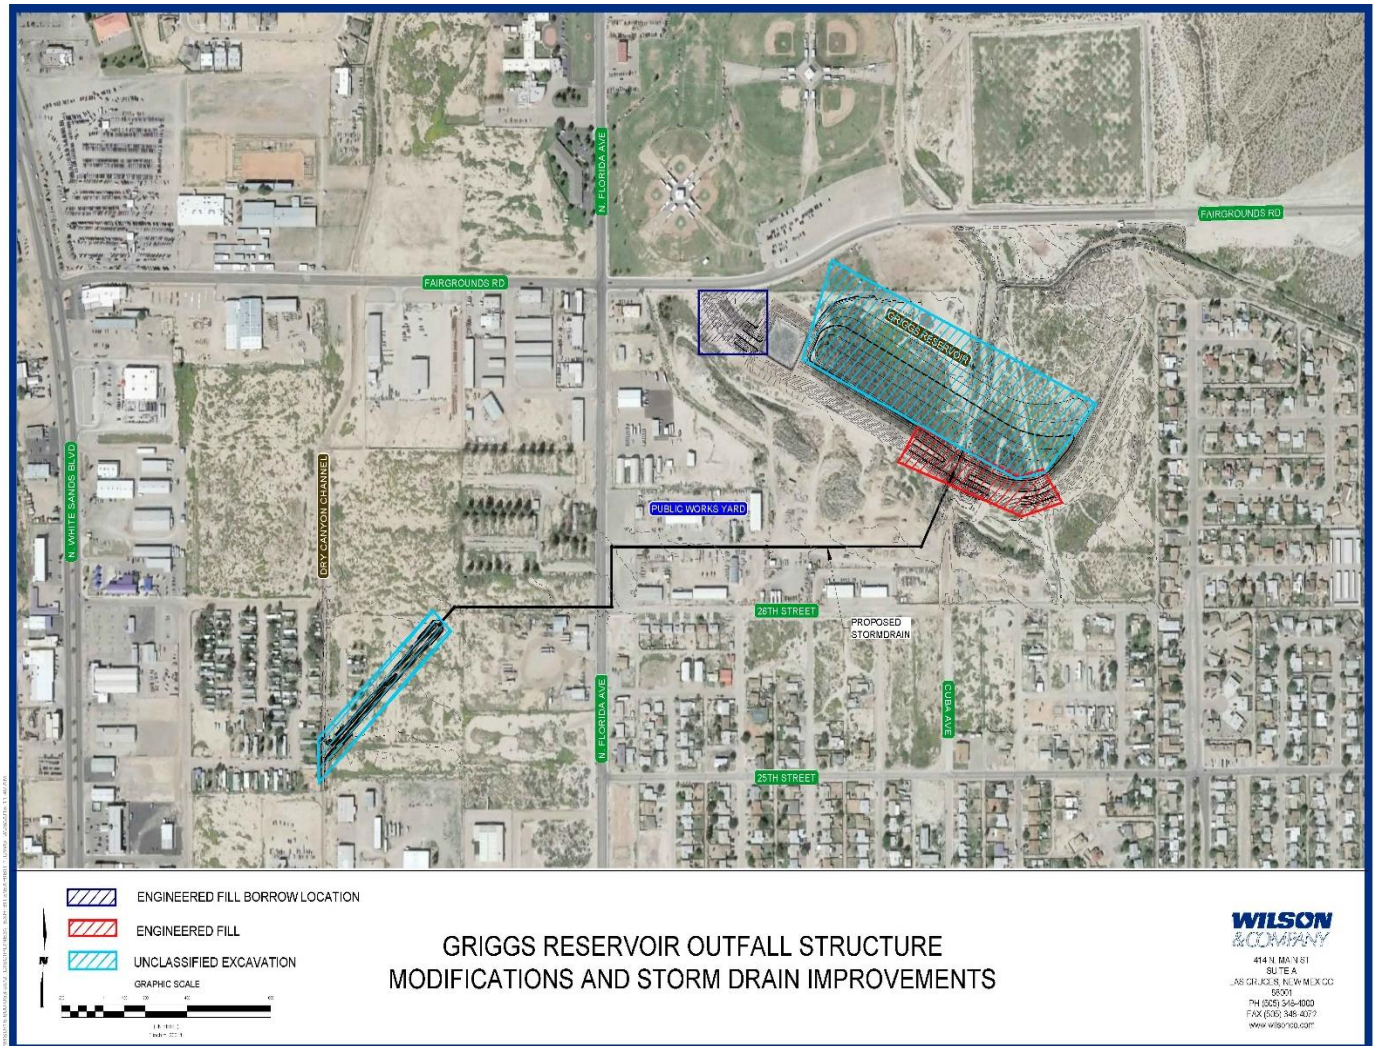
Overview of Griggs Reservoir Outfall Structure Modifications and Storm Drain Improvements.
